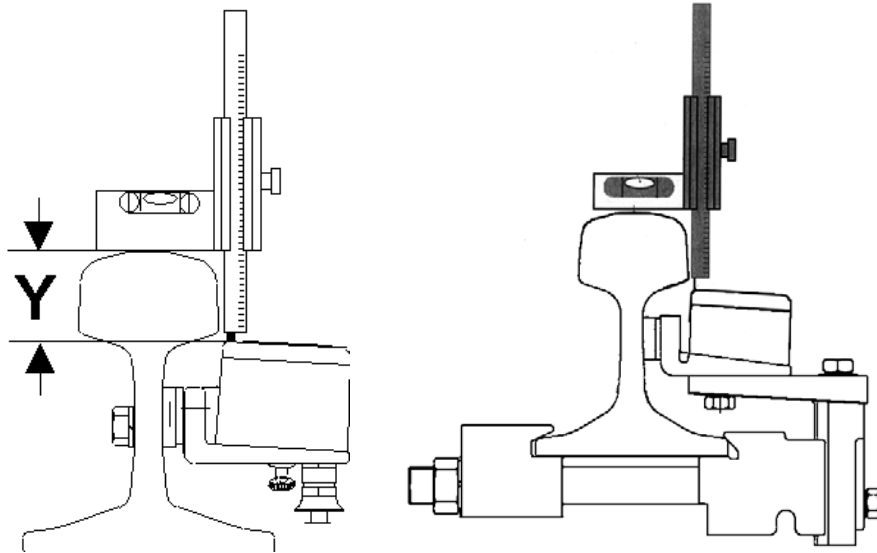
Checking the mounting height of the DSS sensor with SAHL 2
